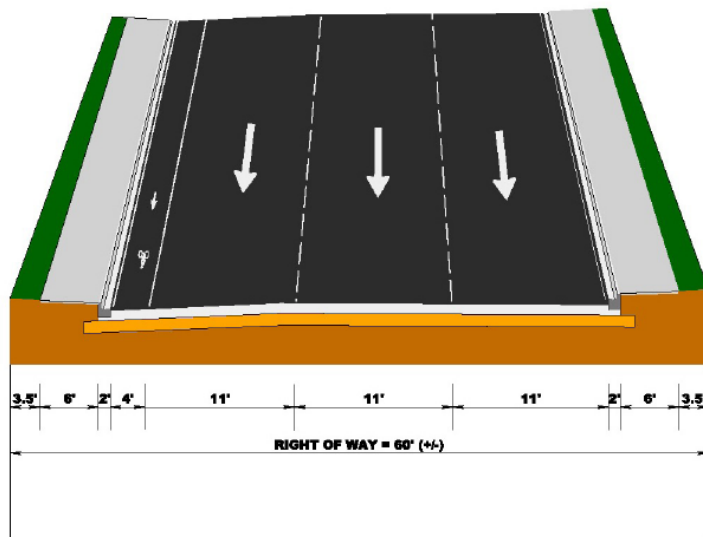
6th Street and US 301/SR 41 (Gall Blvd.) One Way Pair Alternative Proposed Typical Sections.
